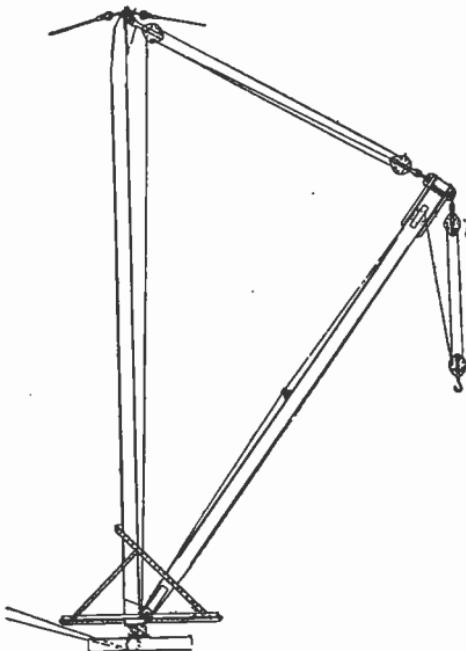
,929.—Guy derrick with bull wheel and swinging gear. *In construction*, all the fittings except the foot irons and sheaves are made of forgings or structural shapes. The foot block and mast step are made with a ball and socket universal joint. Uneven setting or a settling of the derrick supports cannot make this joint pinch or retard the swinging of the boom. A back lock makes it impossible for the mast to be lifted clear of the step. The spider is made of buckled plates. The regular set of iron for a guy derrick includes the mast head block, two sheaves in the foot block, one sheave in the mast step, and one sheave in the boom end.
